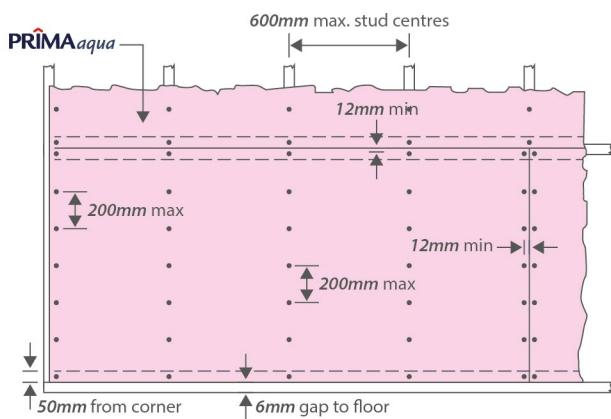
Horizontal Sheet Fixing (Untiled Wall)
